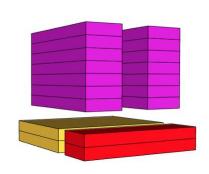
Building Type 1 – Mid-rise Mixed-Use 1 (showing Claridge Royale Condos, 245 Rideau Street, Ottawa, ON).
